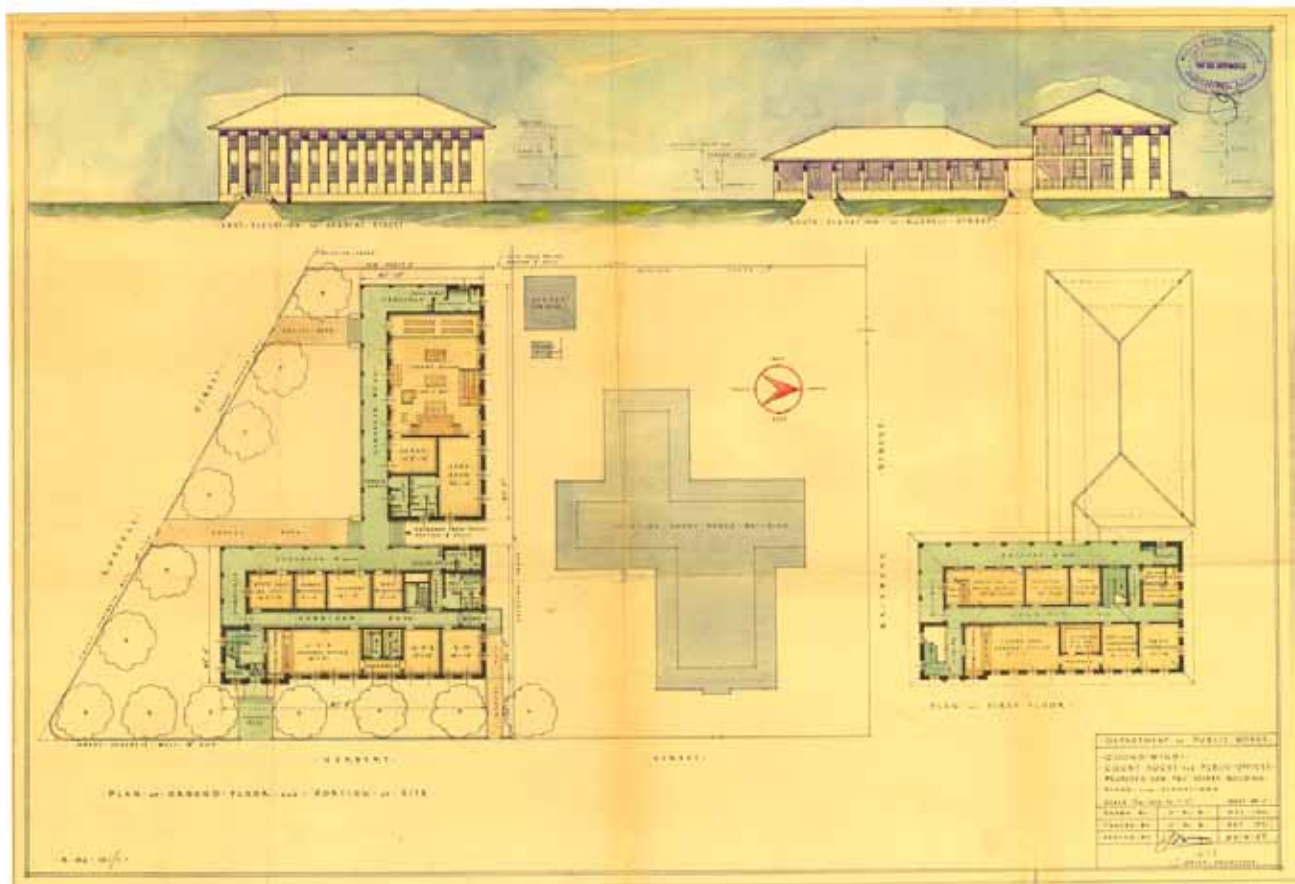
Plan and elevations, Goondiwindi Court House and Public Offices, 1951 (QSA 301063)
